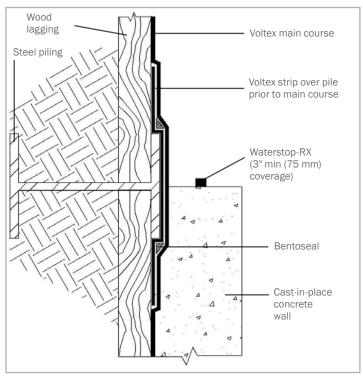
Lagging secured to outside surface of front pile flange providing smooth surface (Plan View).
